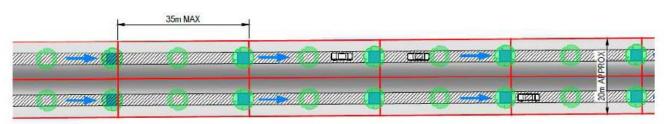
Potential Stormwater Tree Pit Layout in Central City Street
